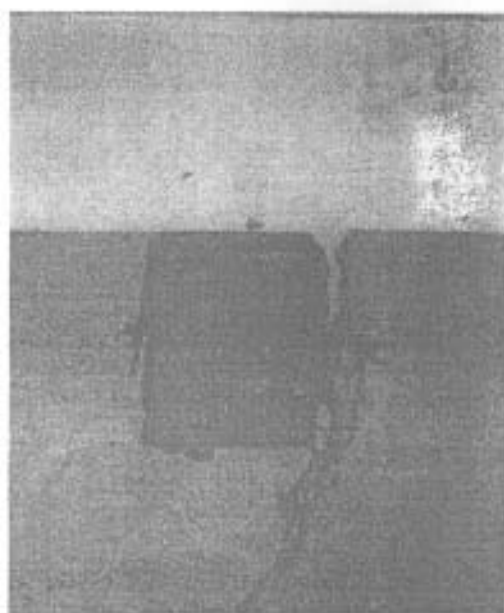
Shear crack in concrete for the beams PC10L3. No visible failure occurred in the externally bonded composite plate.
